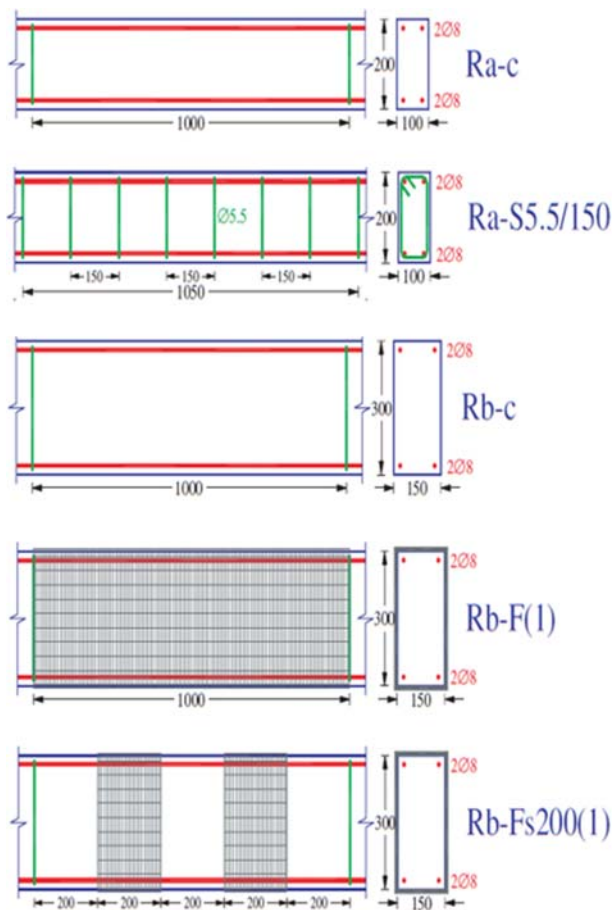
Detailing of Tested Specimens (Chalioris, 2008)
